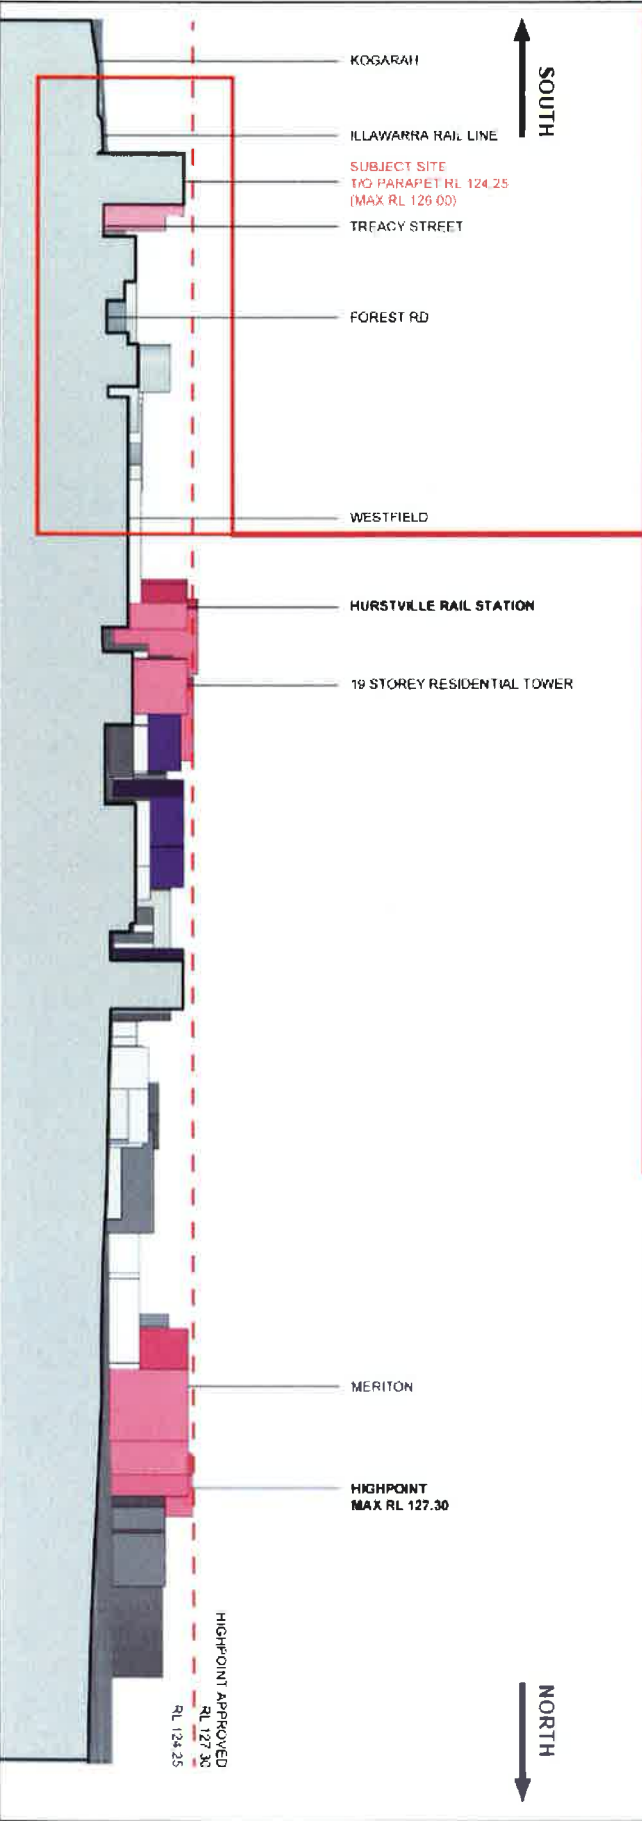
City Centre South-North Cross Section (Source: Proponent's PPR)
